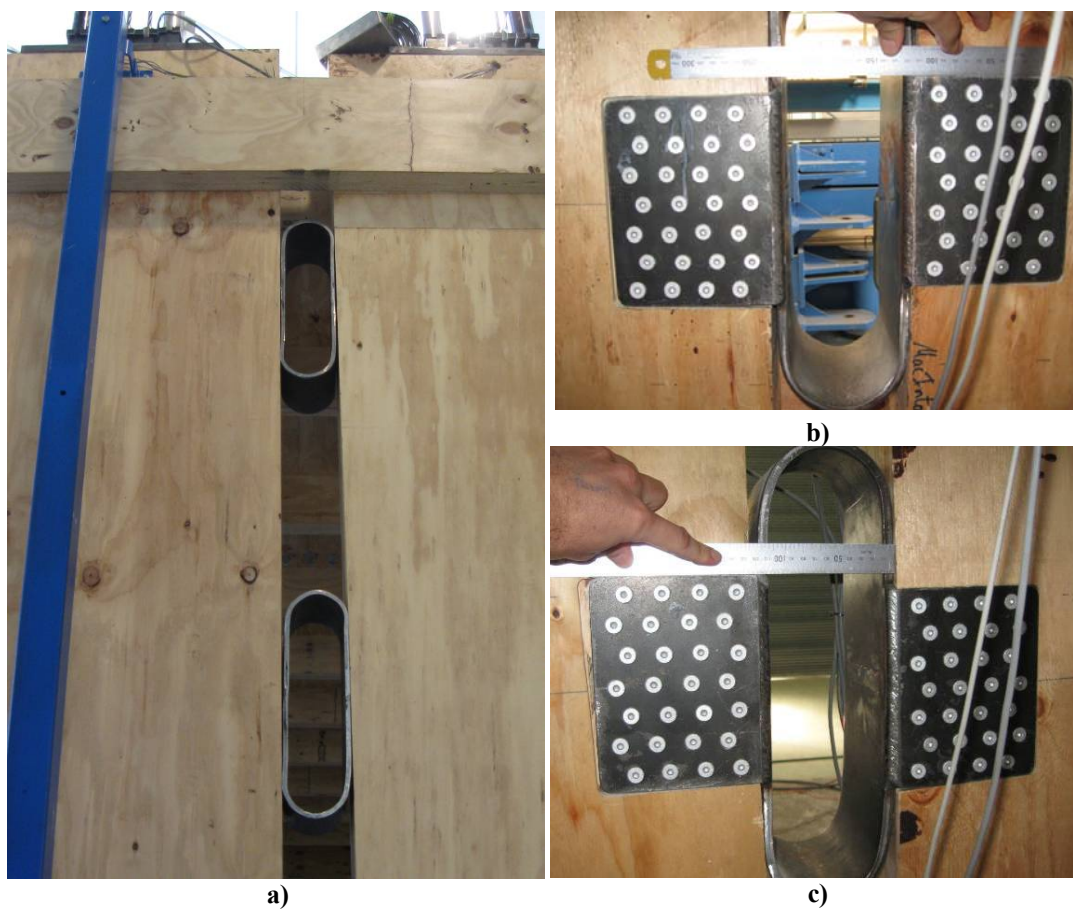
Deformation of UFP couplers a) West walls, UFP 3 and 4 b) West walls, UFP 2 c) East walls, UFP 2
